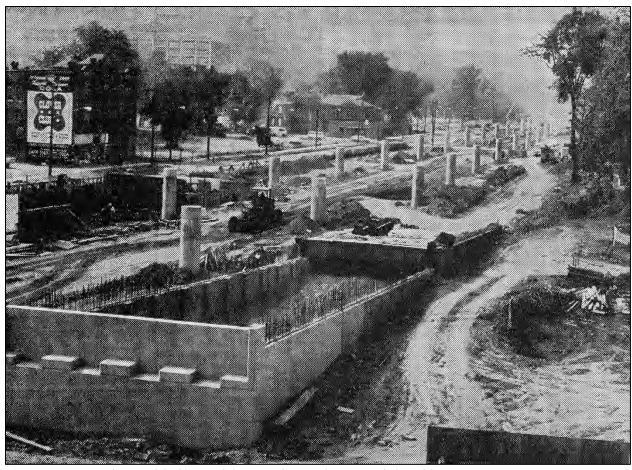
1965 photograph looking south from East Genesee Street toward Almond Street.
